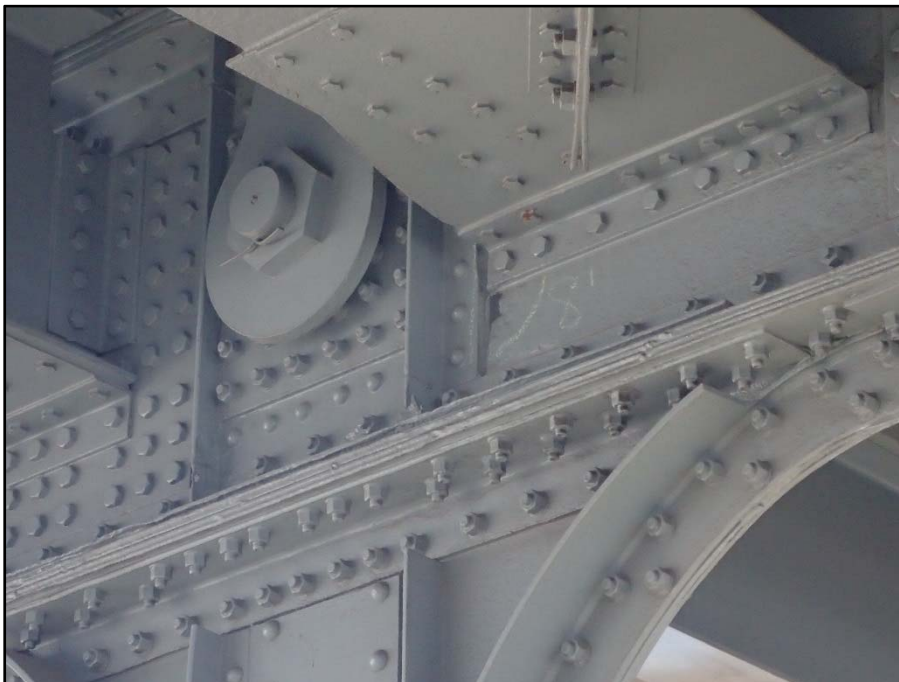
Span 4 Upper Deck Floorbeam 8'; web perforation below the upper deck lateral bracing gusset plate on the north arch
